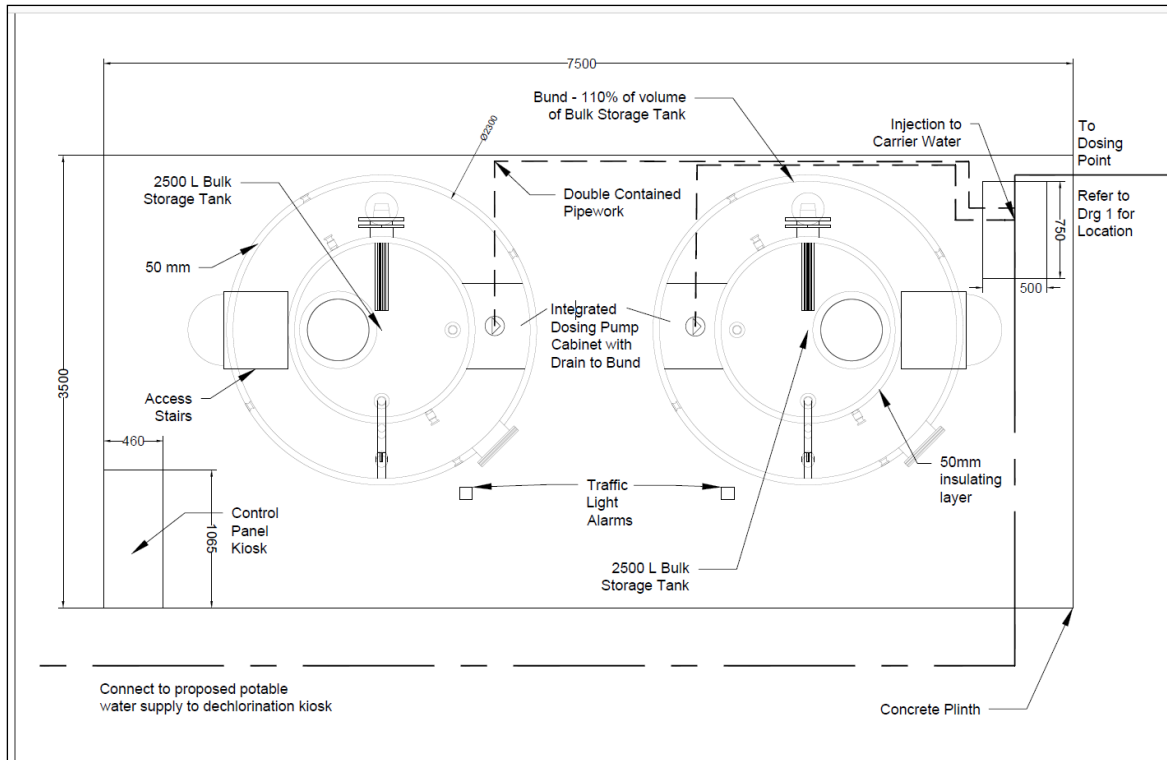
Plan and elevation drawings of a typical orthophosphate dosing unit
